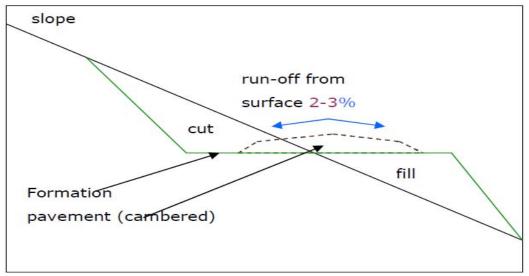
Camber details in cross section profile (Stampfer et al., 2005)
